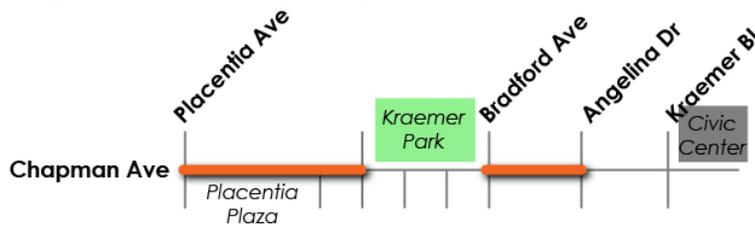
Existing Street Section, Chapman Avenue: Placentia Avenue to Walnut Avenue, Bradford Avenue to Angelina Drive Key Map
